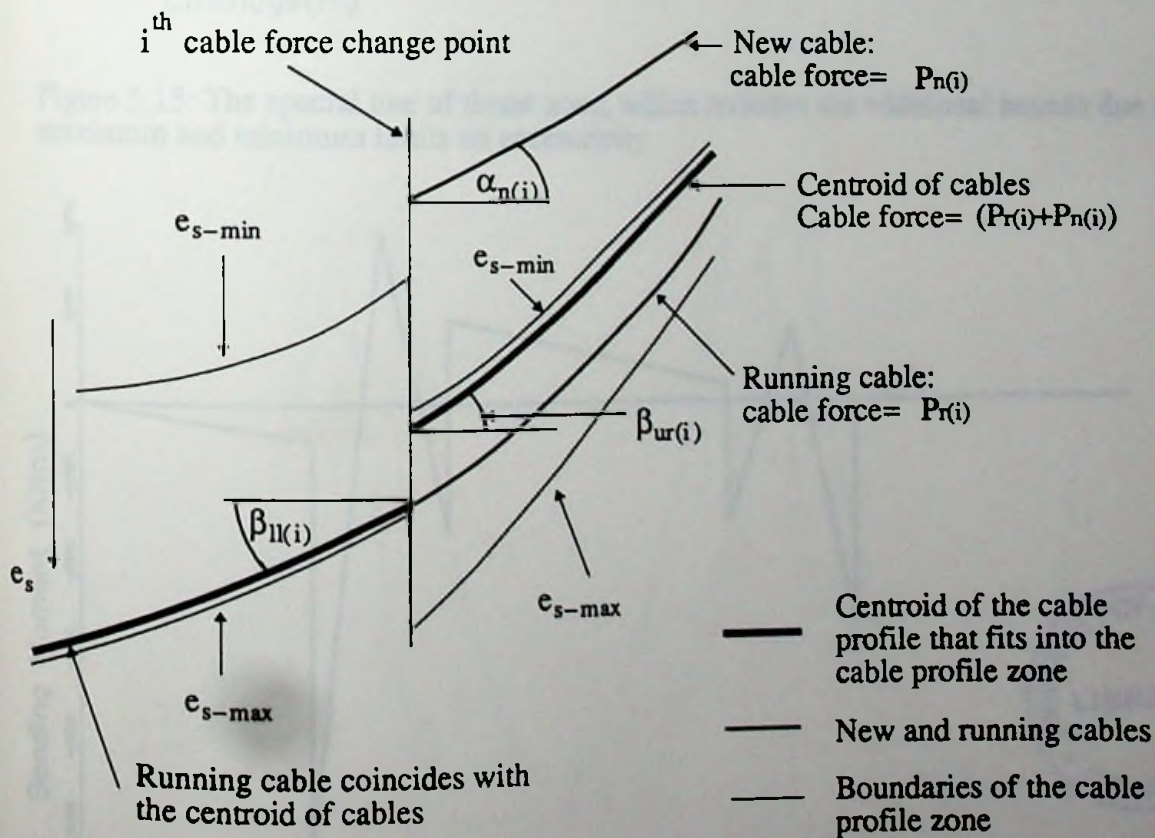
The inclination of the resultant cable placed at the limit of eccentricity at a section where the new cable is started (e_s not e_p because dealing with angles which are distorted in the plot of e_p)
